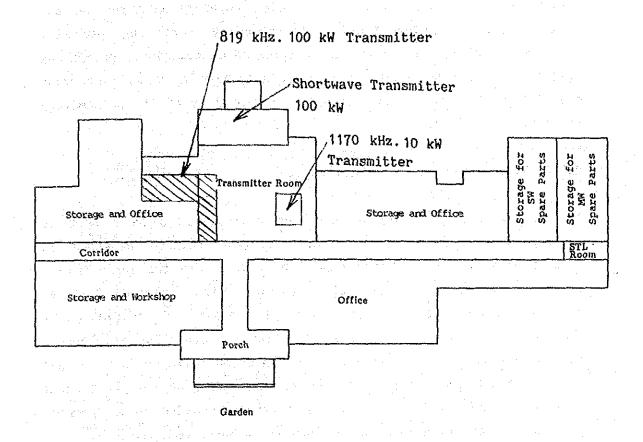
Floor Layout of Savar Transmitting Station (Existing)
